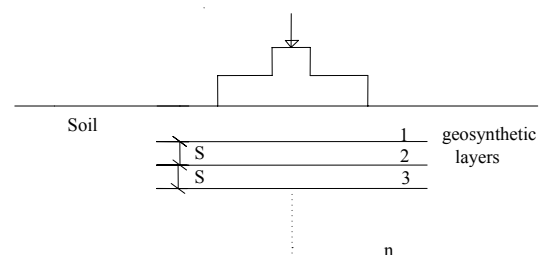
h Geosynthetic use for reinforcement the poor soil under footing
